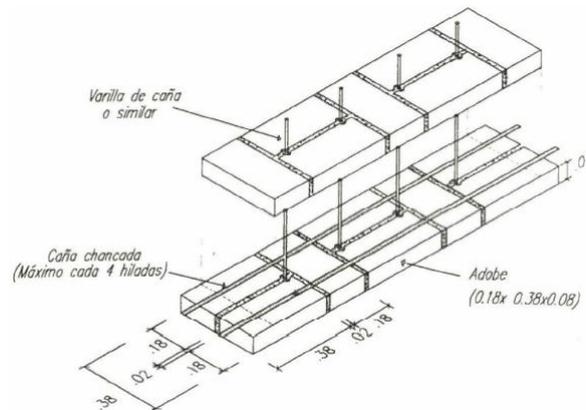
Vertical and horizontal adobe reinforcement. After E.80 [11]
